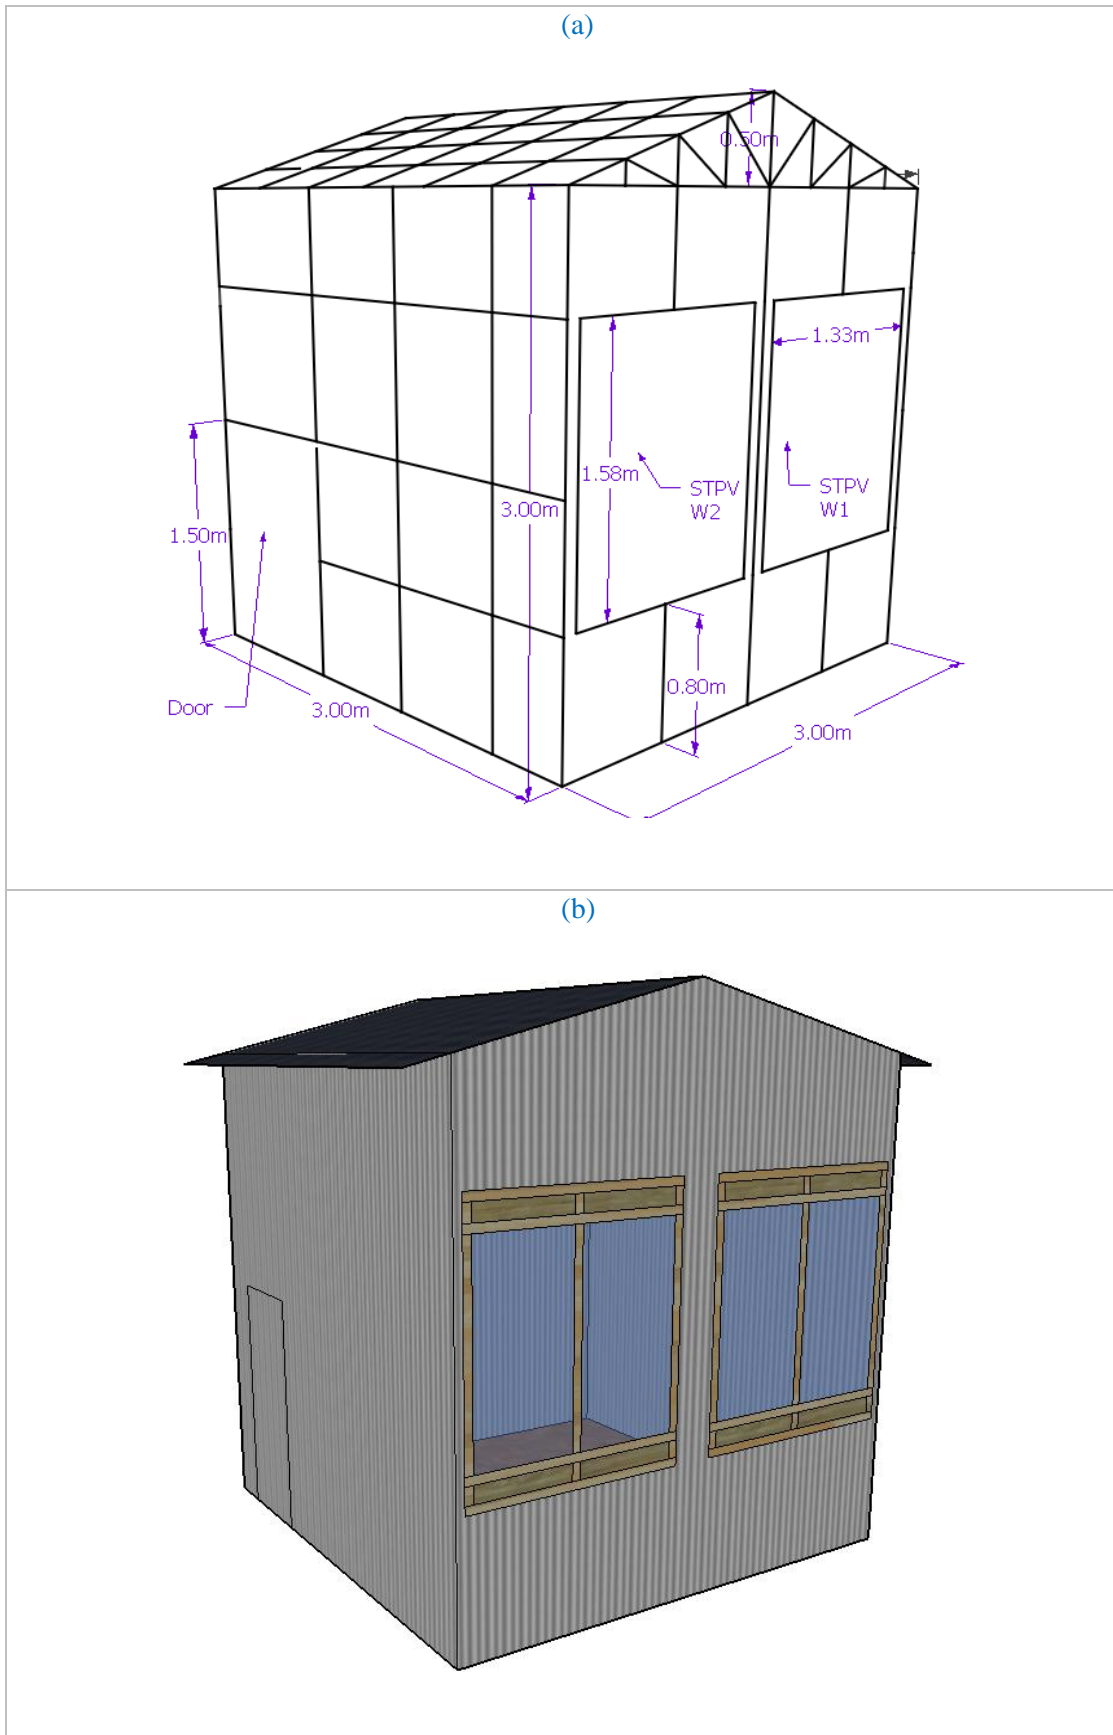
Drawing of the test chamber (a) with dimension, (b) rendered image
